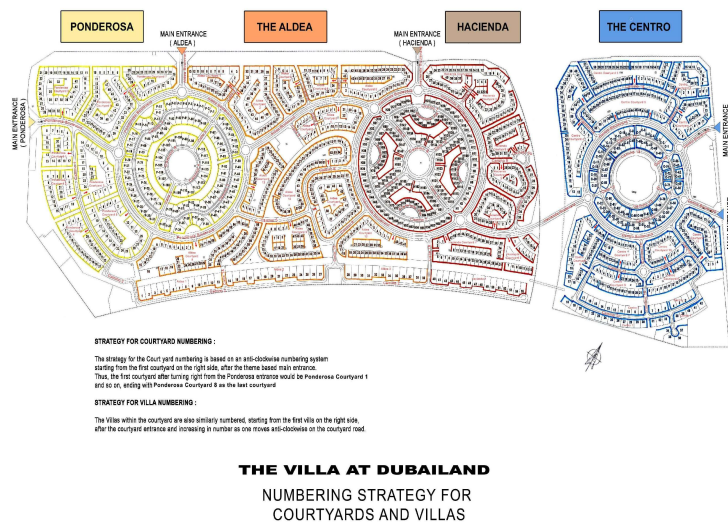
Location: The Villa. Source: [www.worldfloorplans.com](http://www.worldfloorplans.com)
